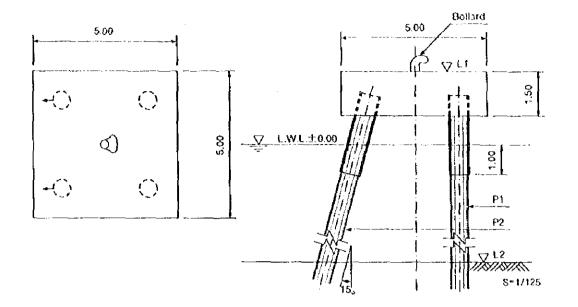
Layout of Mooring Facilities of Biak Ferry Terminal
